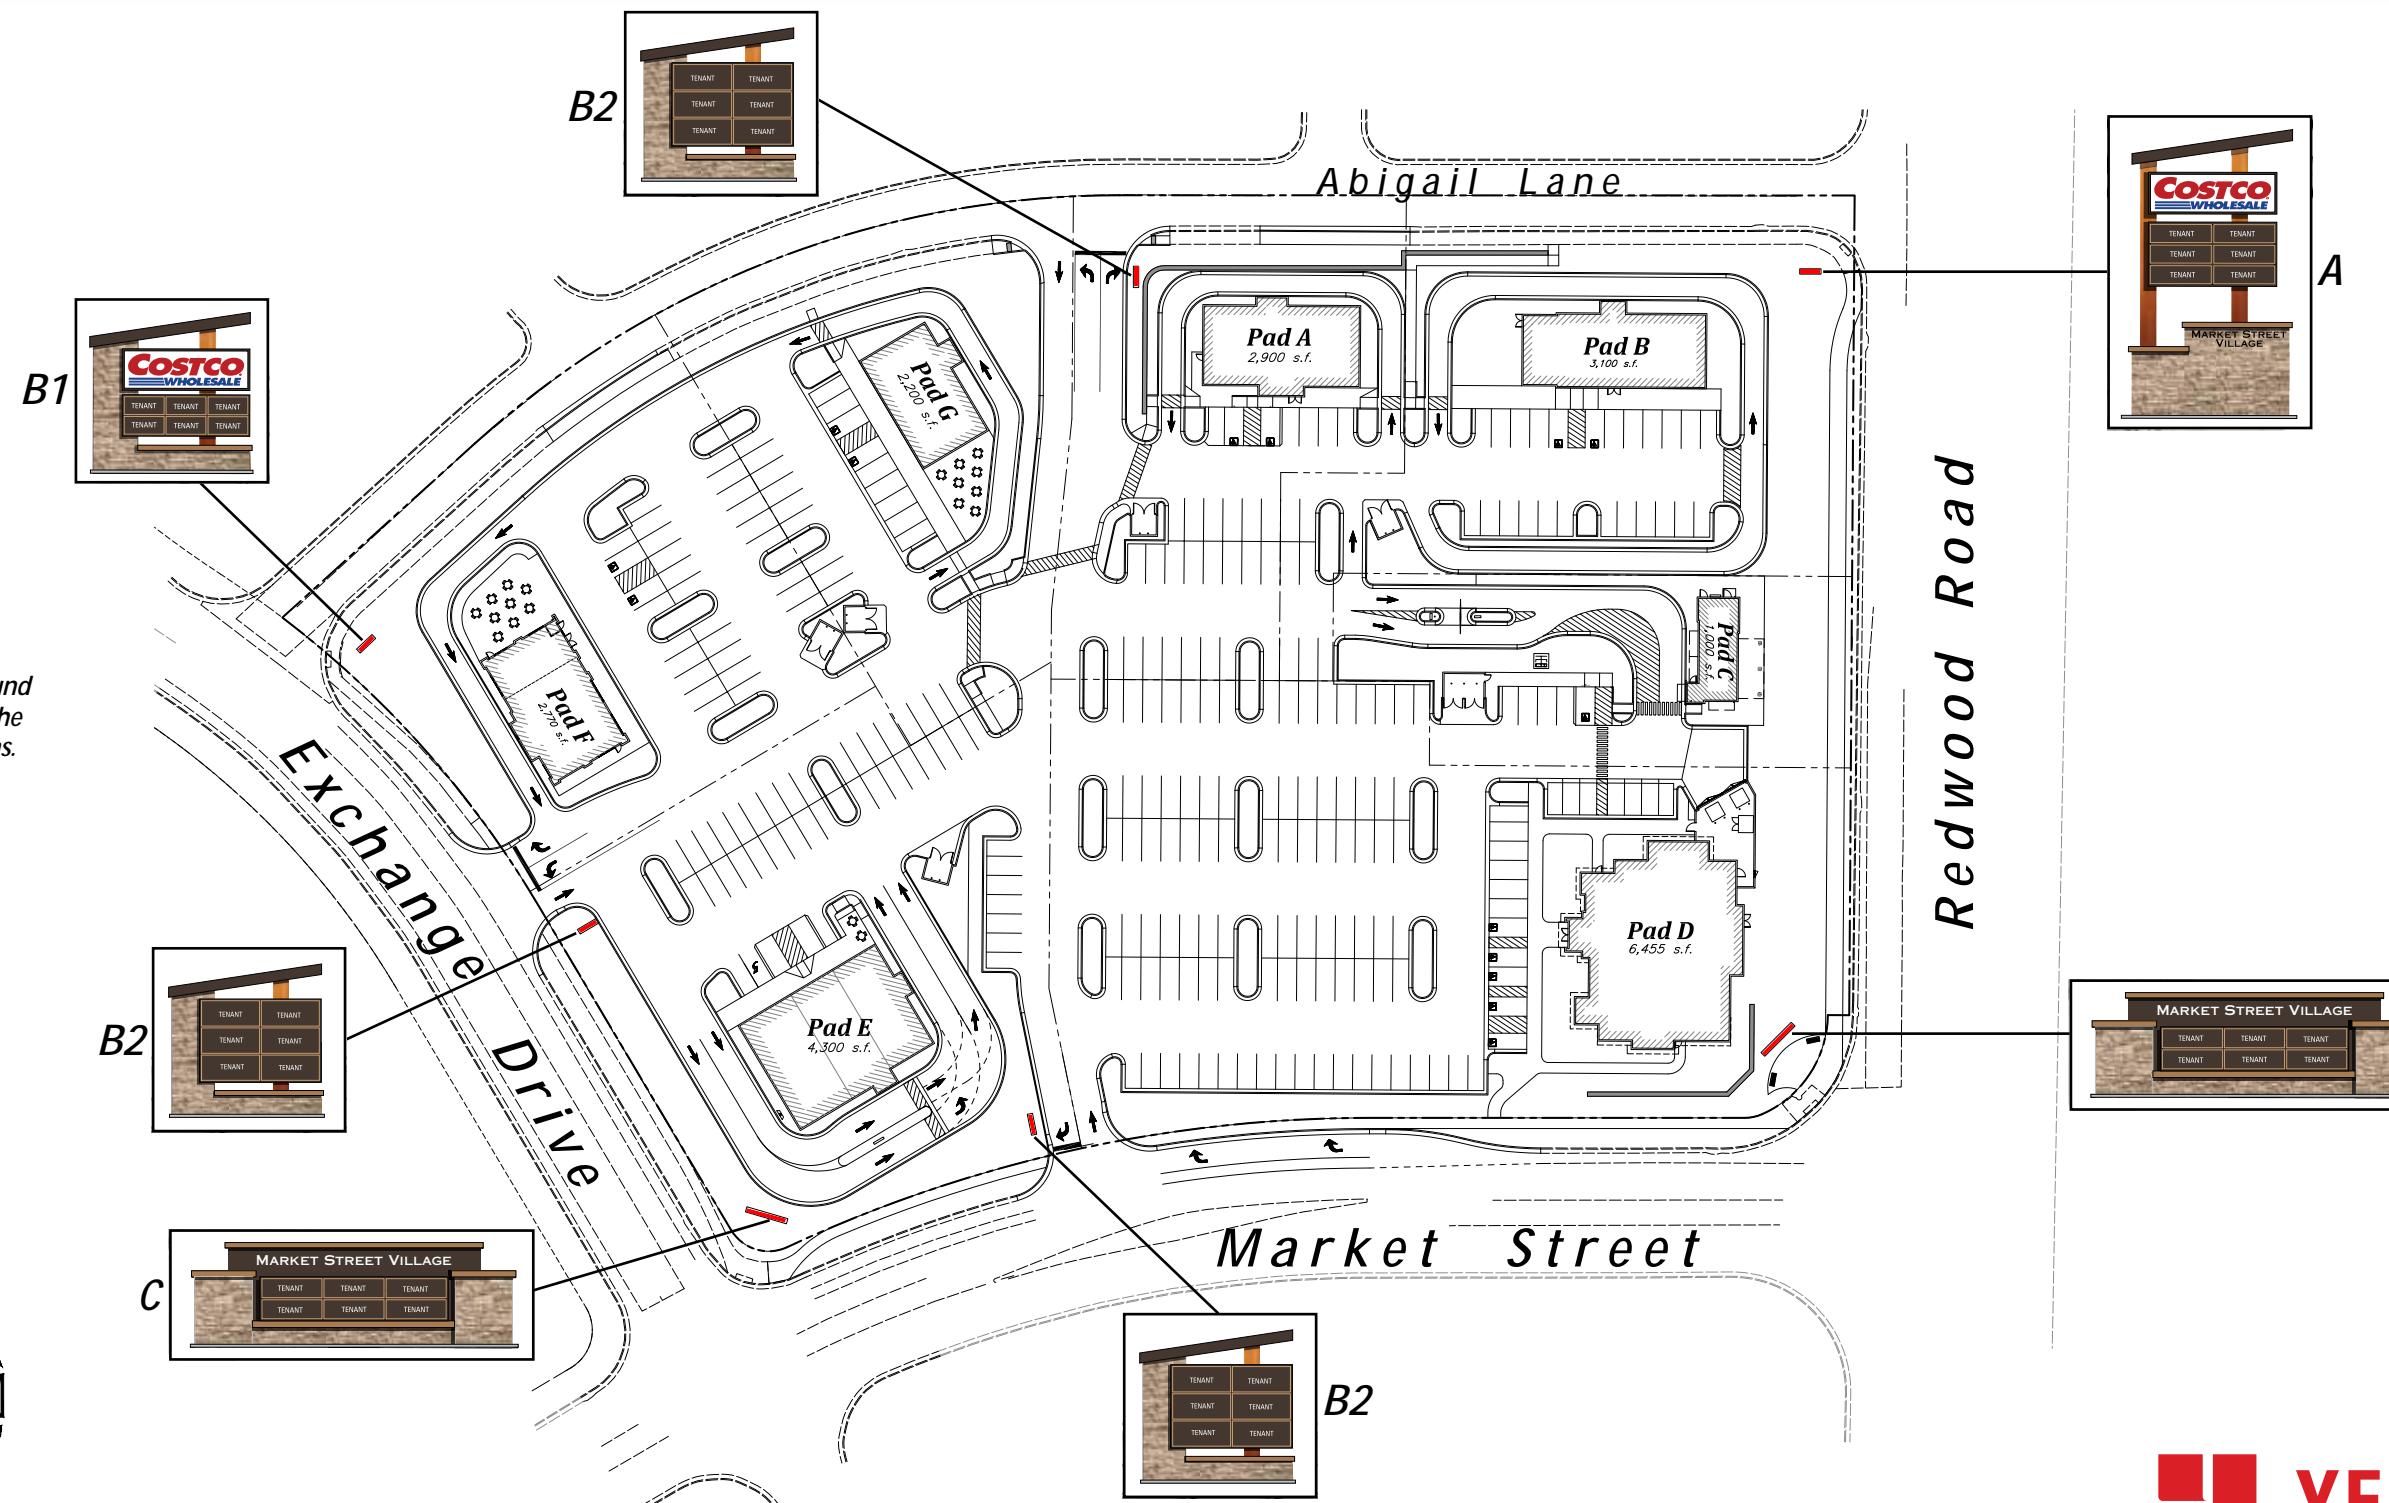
Signage PlanMarket Street Village - Village Plan IIYESCOSaratoga Springs, UtahCCA-Acquisition Company, LLCANWA
